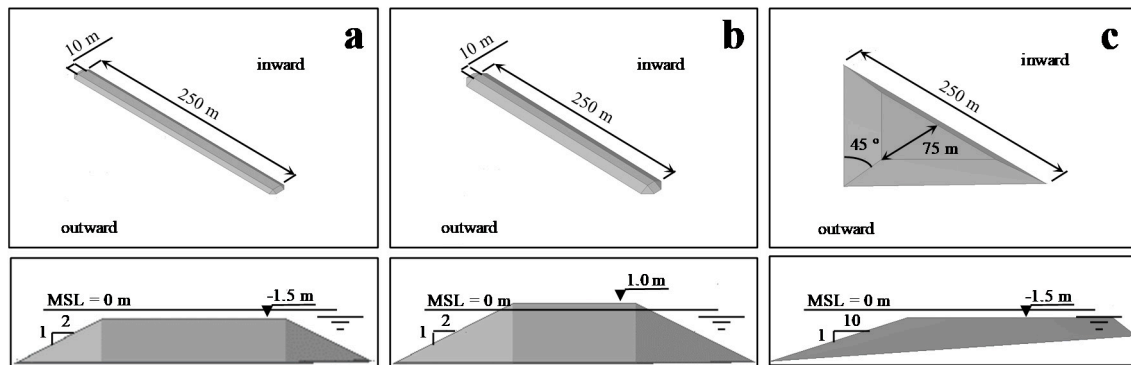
Geometrical shapes considered in this study (upper panel: plan view; lower panel: cross-section): (a) submerged detached breakwater; (b) emerged detached breakwater; (c) multifunctional artificial reefs (MFAR).
